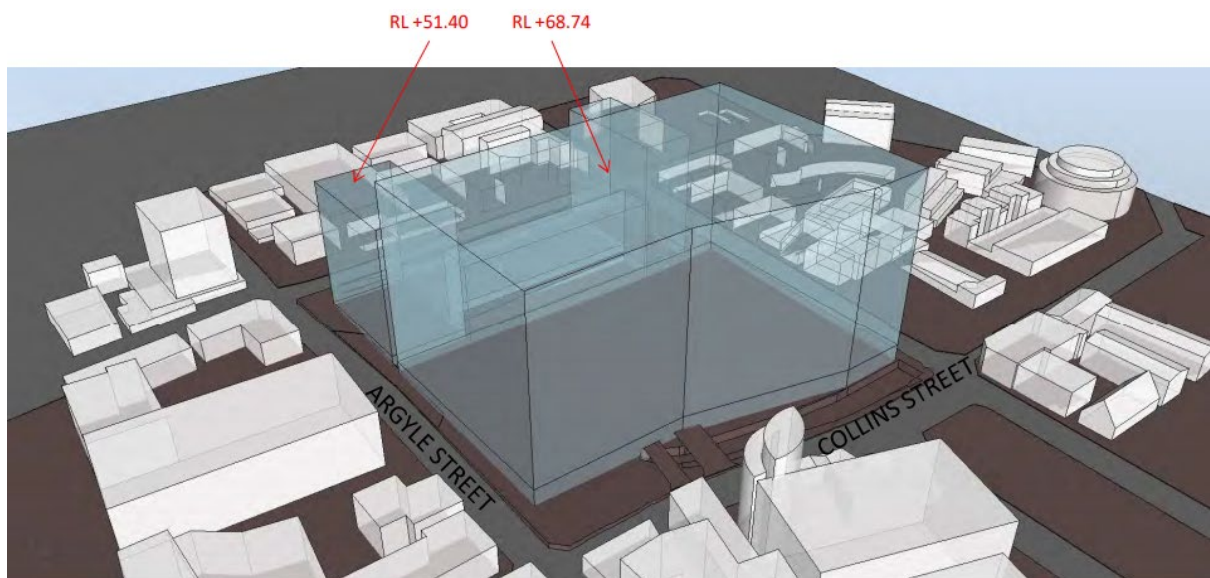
Building Envelope - three dimensional view 6
